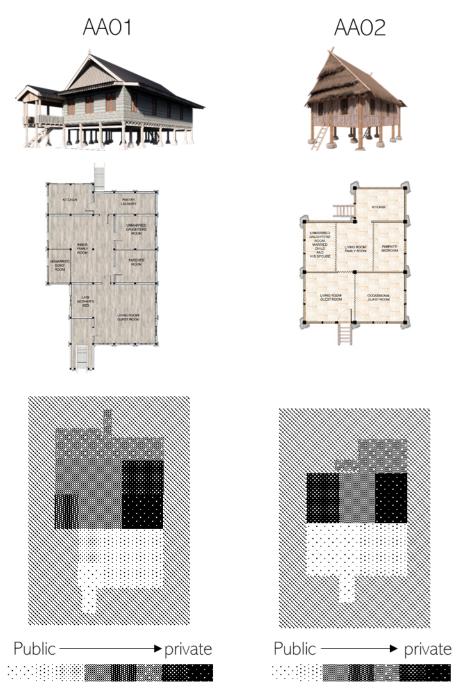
AA's houses in Nanga Nae with 3D render, floor plan and layout analysis
